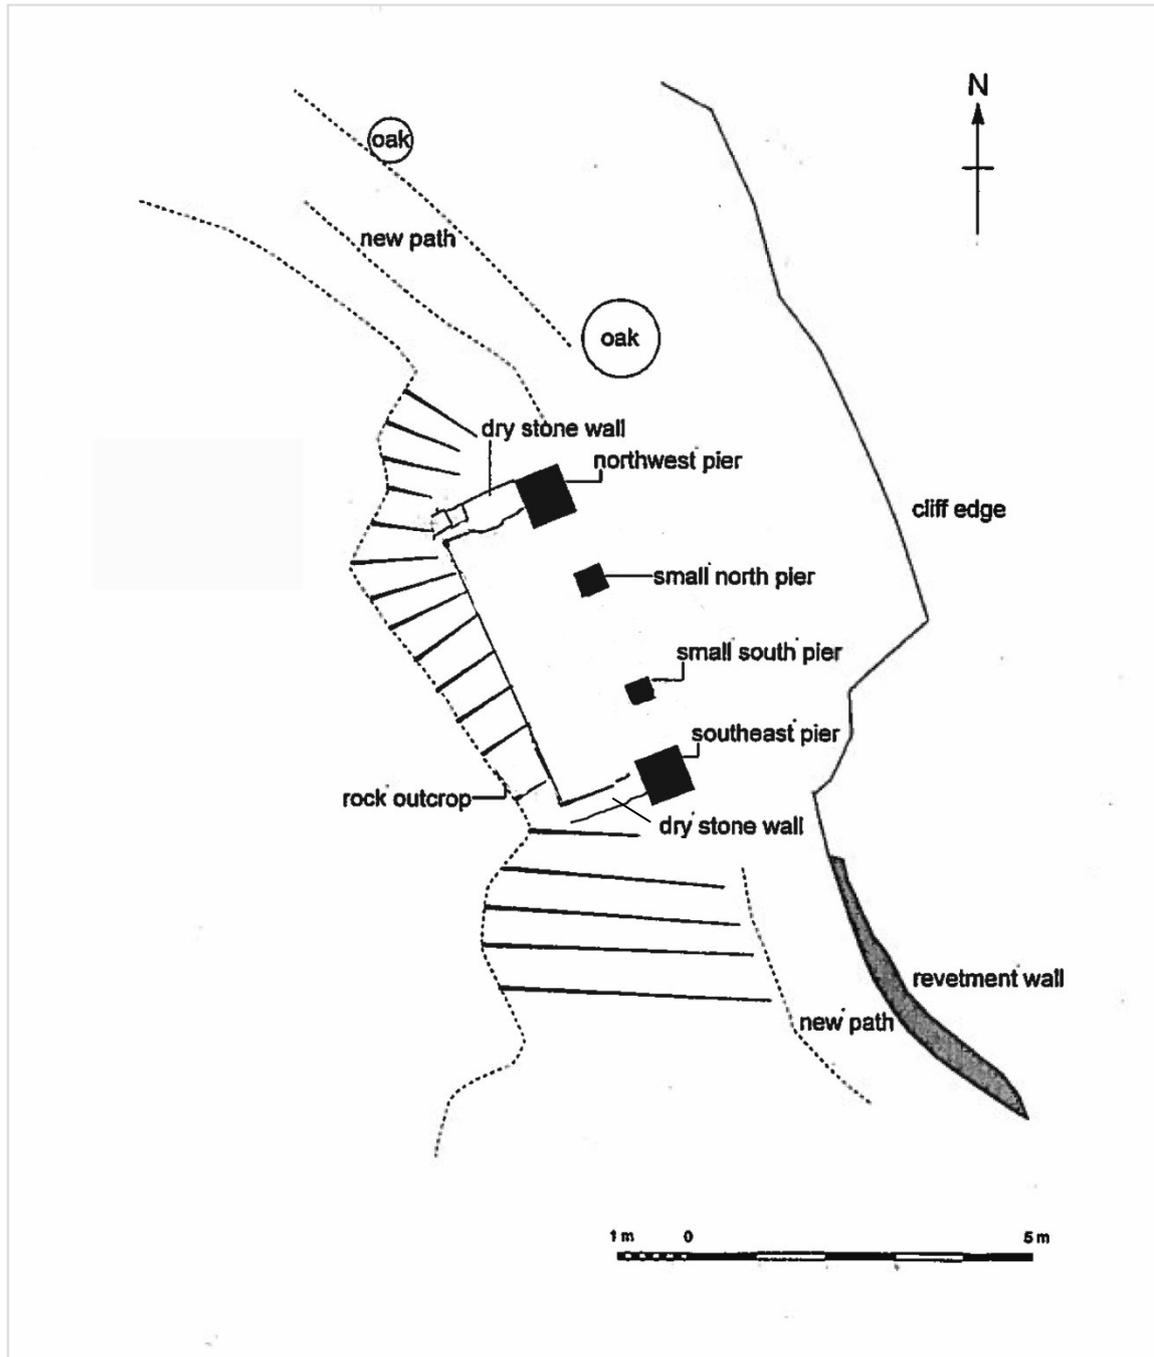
The site plan of the Gothic Arcade as recorded in 2003 amended to show the position of the rear retaining wall.
